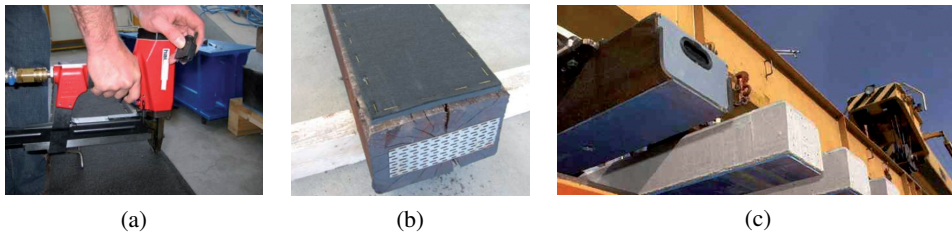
Wooden and steel rail supports: (a) USP attached to the wooden support; (b) wooden support with USP [21]; (c) steel support with attached USP (further visible concrete turnout bearers with USPs) [21]
